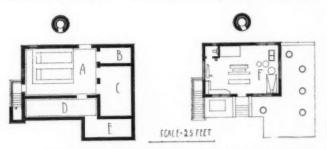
Floor plan of the power plant of the Riverside Sanatorium.
